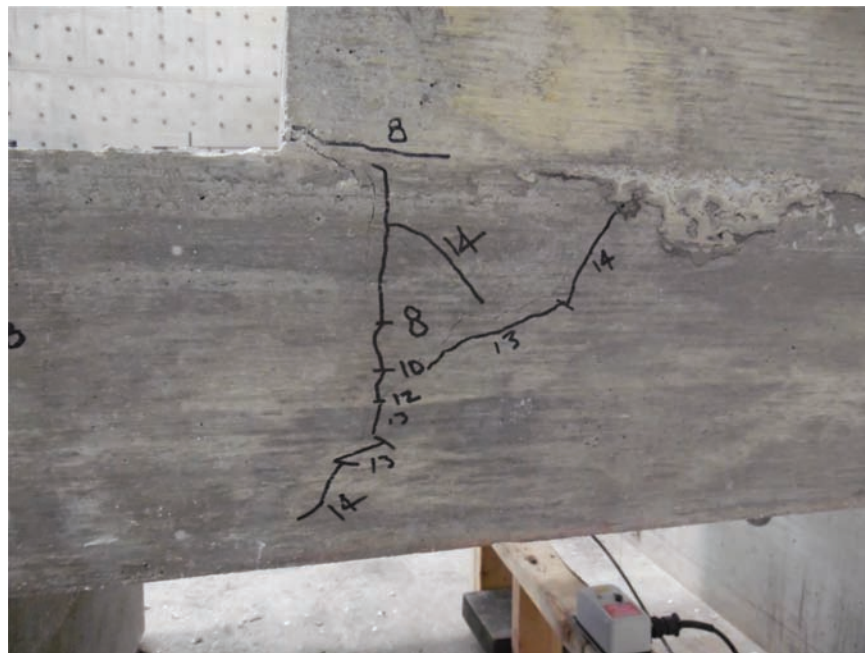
Strip Specimen 5 diagonal crack formation.
